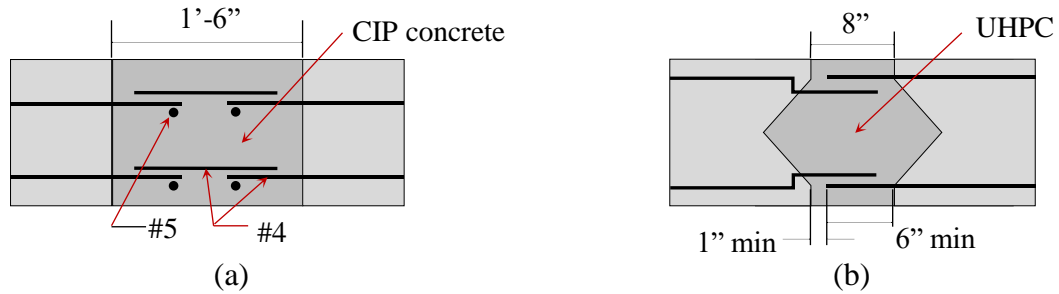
(a) Most common non-UHPC connection detail (Adapted from Biswas [56]) and (b) most common UHPC connection detail (adapted from Graybeal [3])
